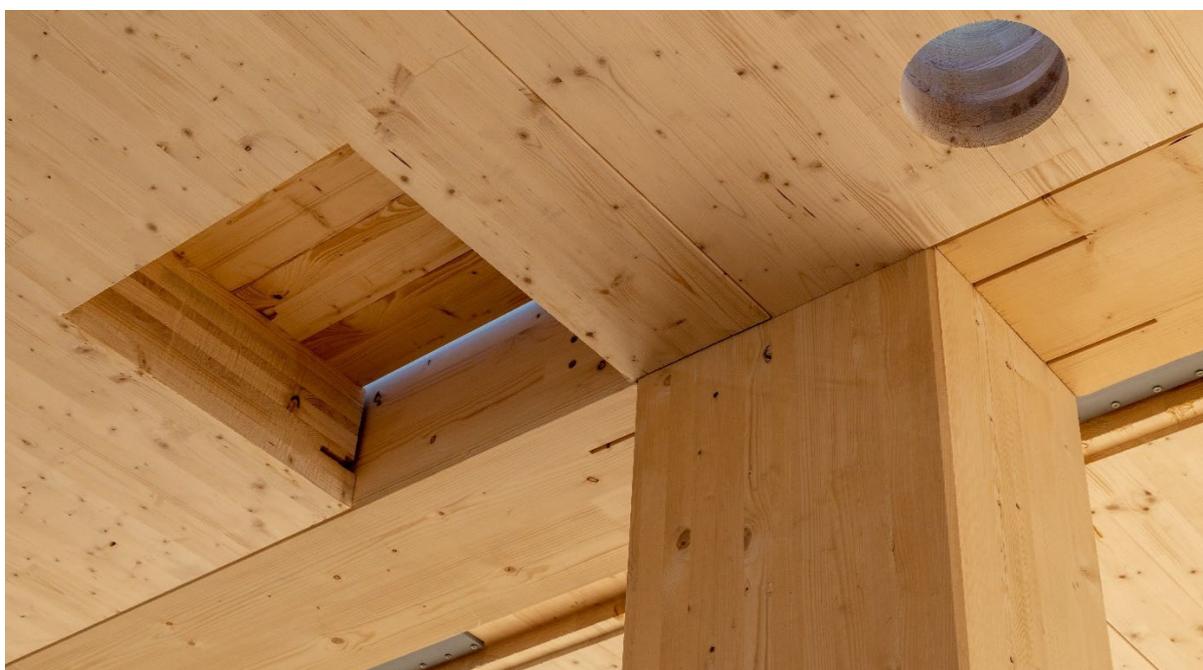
column-beam-CLT connection – MAHTIS © Patrick Raffin
